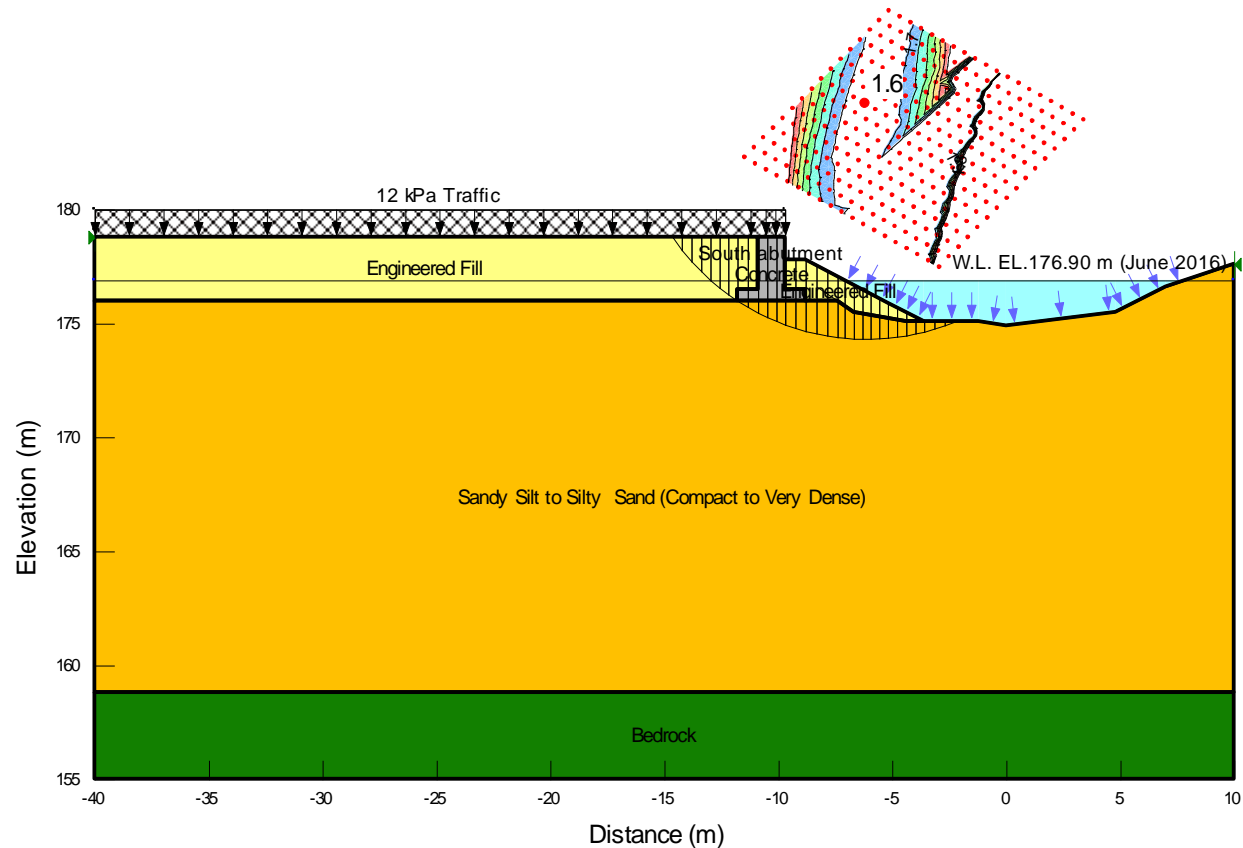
Proposed Permanent Bridge South abutment - Drained Static Condition
